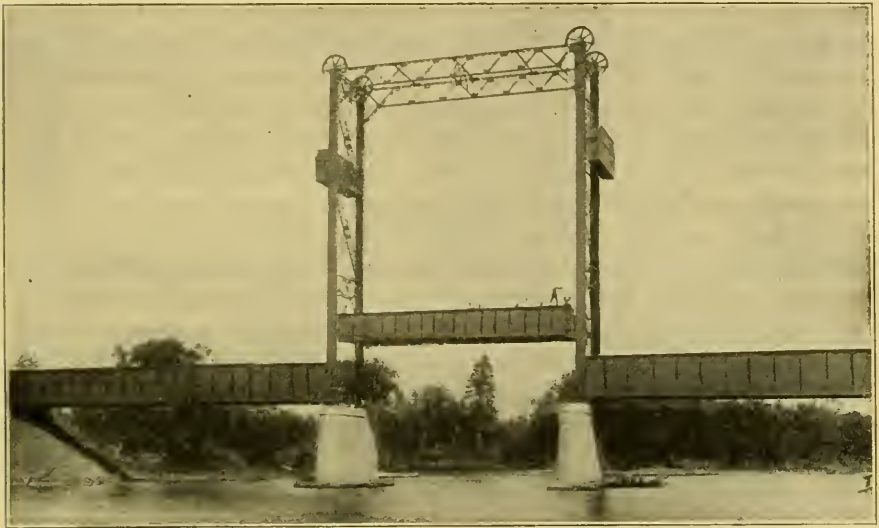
b. St. John and Quebec Railway Bridge over the Oromocto River in New Brunswick.
